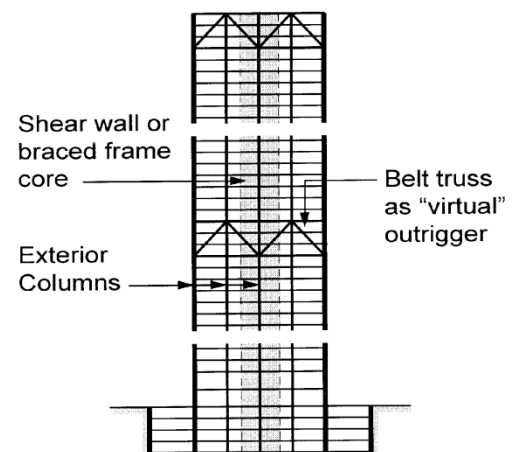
Structure with belt trusses as "virtual" outriggers
